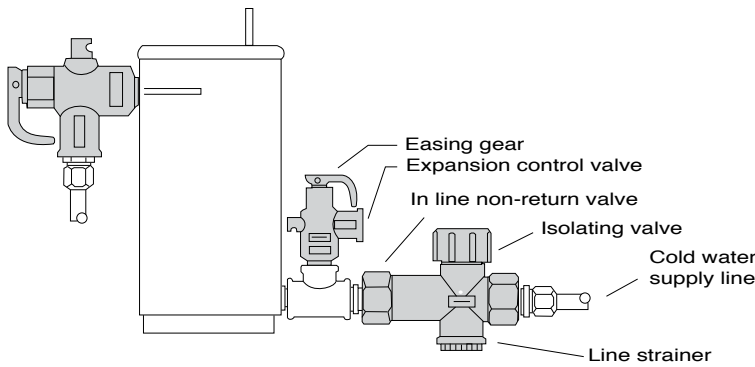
Typical installation mains pressure storage water heater with expansion control valve
